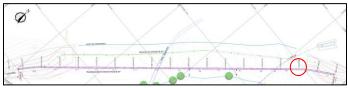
NEW PIPELINE LAYOUT ON HORIZONTAL AXIS
